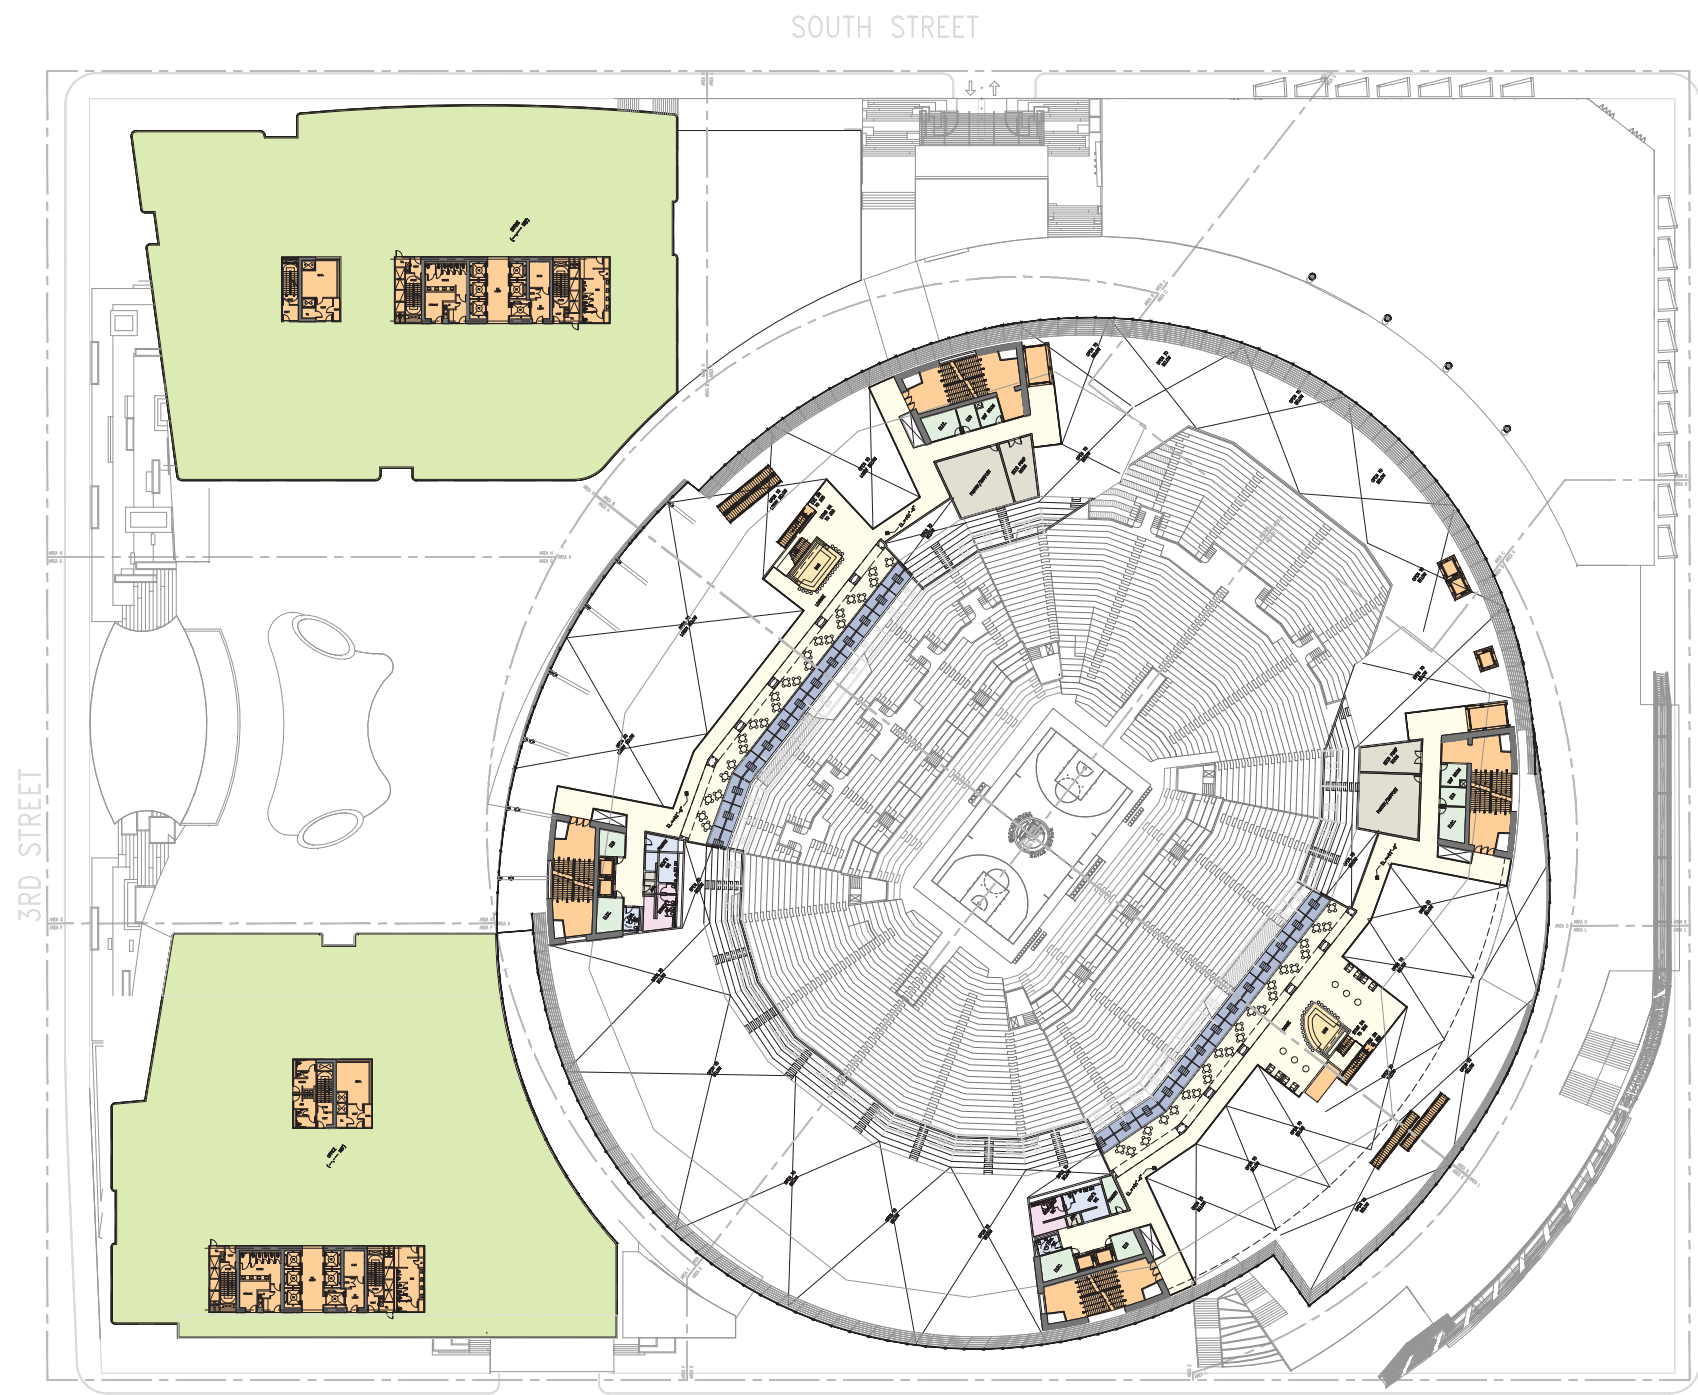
Suite Level: Traditional Suite seating options for event center attendees, located at +39'0" Food Hall Roof: Roof height of the northeast corner structure will measure +41'0"
